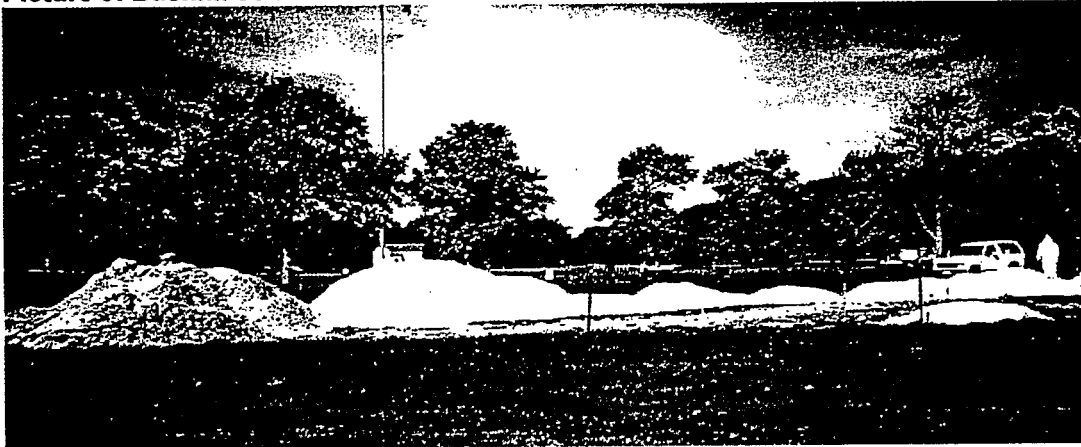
Expanded deep excavation at AOC 16F on 10/11/00, facing South
